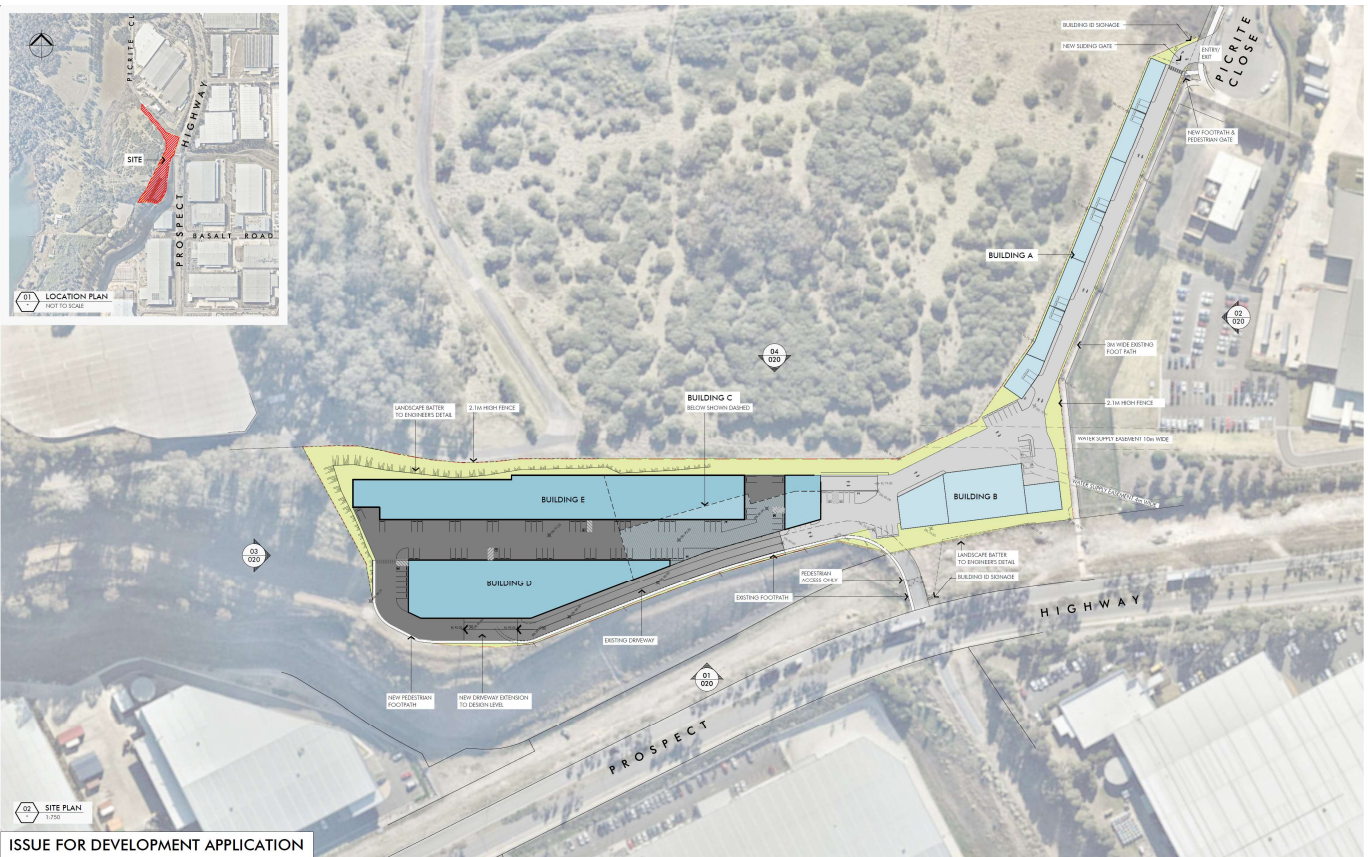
Precinct F Site Plan – As Proposed (Source: Nettleton Tribe)
